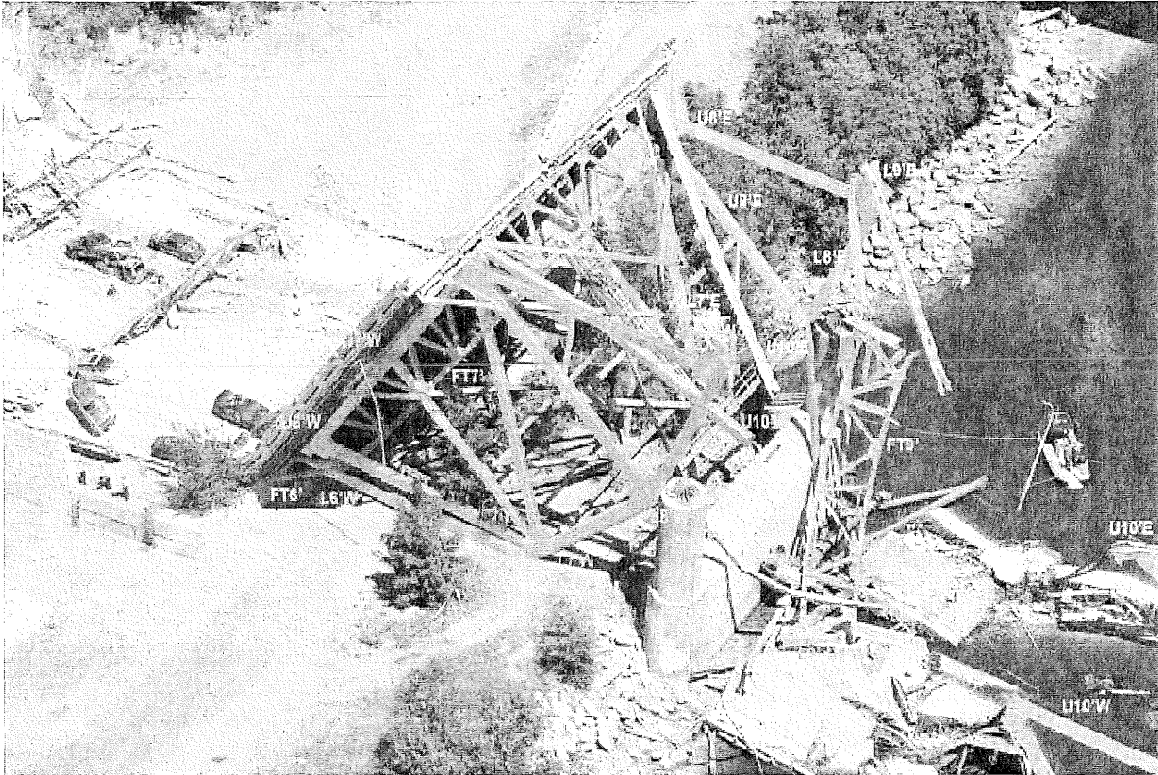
Post-collapse view of north bank of river at Pier 7.
